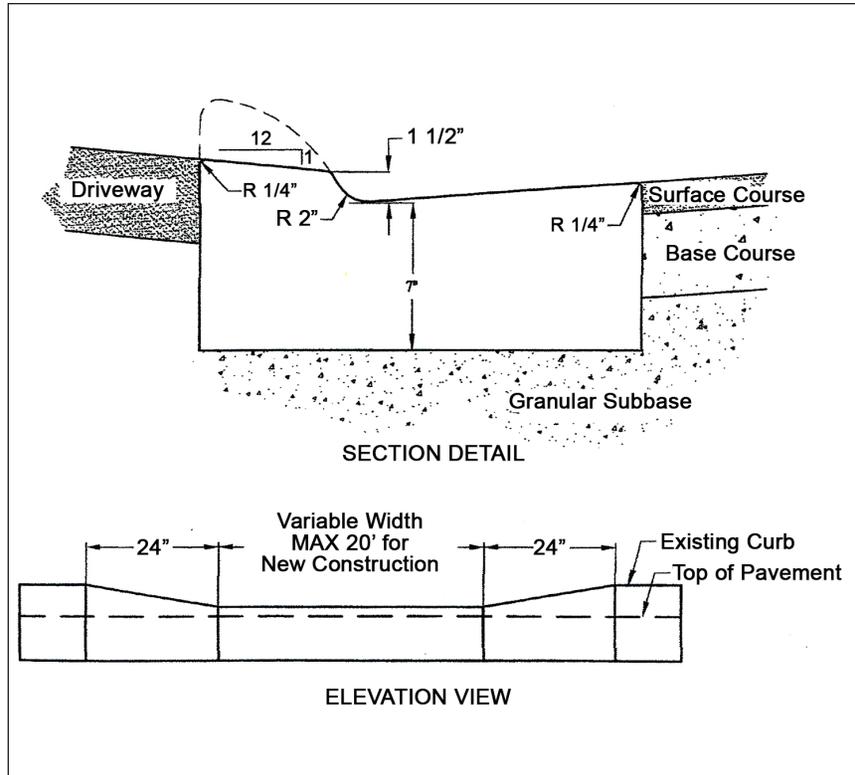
Driveway Curb-cut Detail for Rolled Curb
